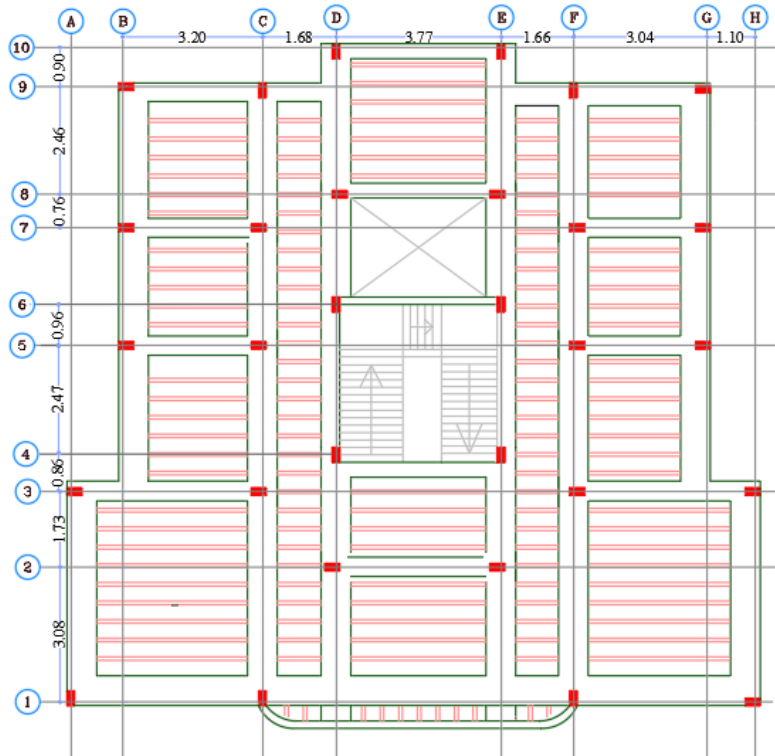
Structural elements of the building, ribbed slab, embedded beams and columns.
